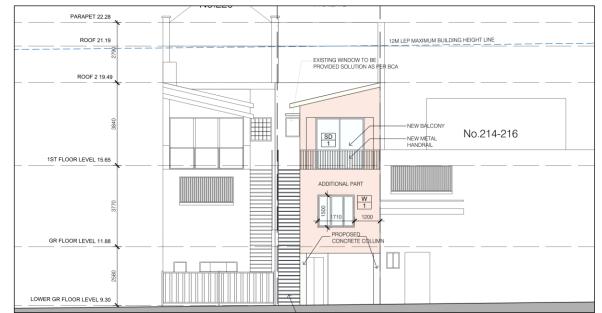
Proposed north elevation (source: Vivi building design, dated 13/12/2024)
